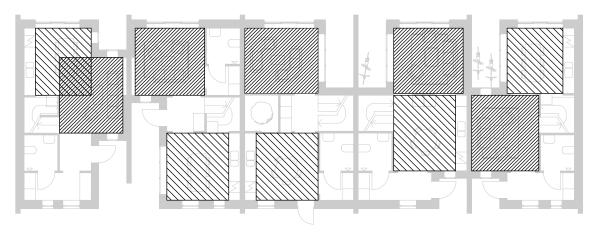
Ground floor connections between kitchen and livingroom 1:200
